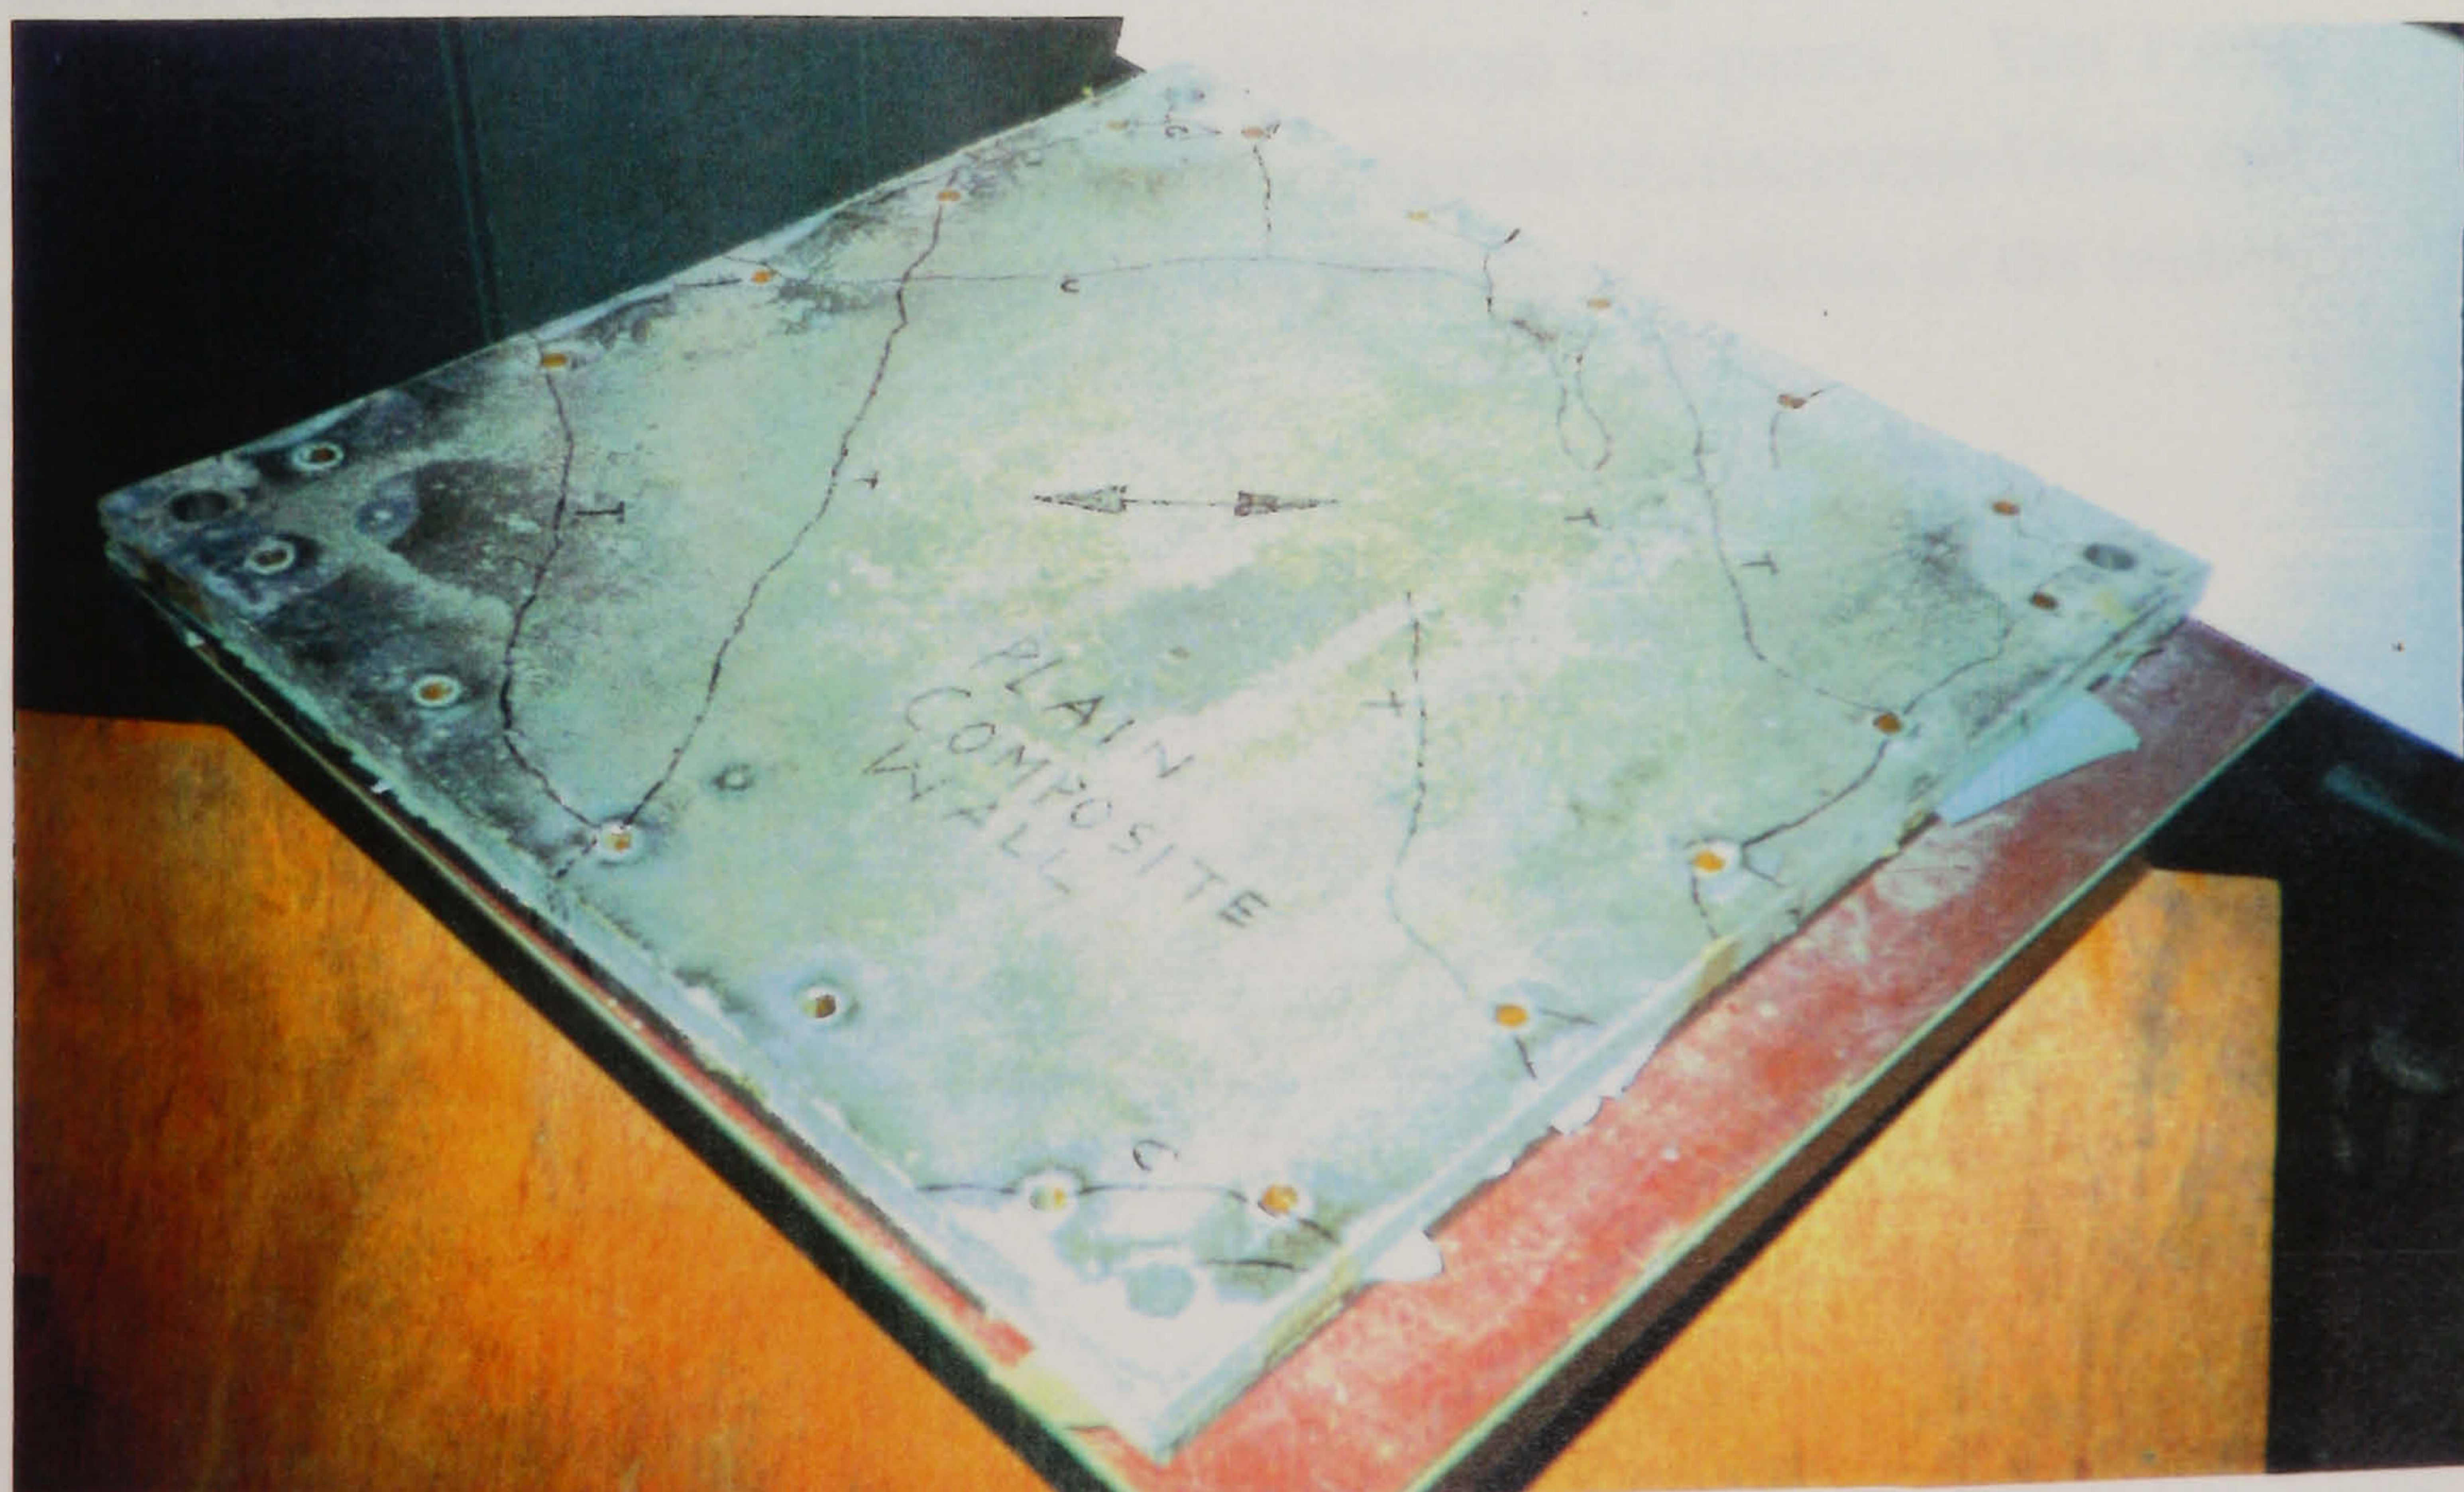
(a): Cracking in concrete core ( Test 1)
